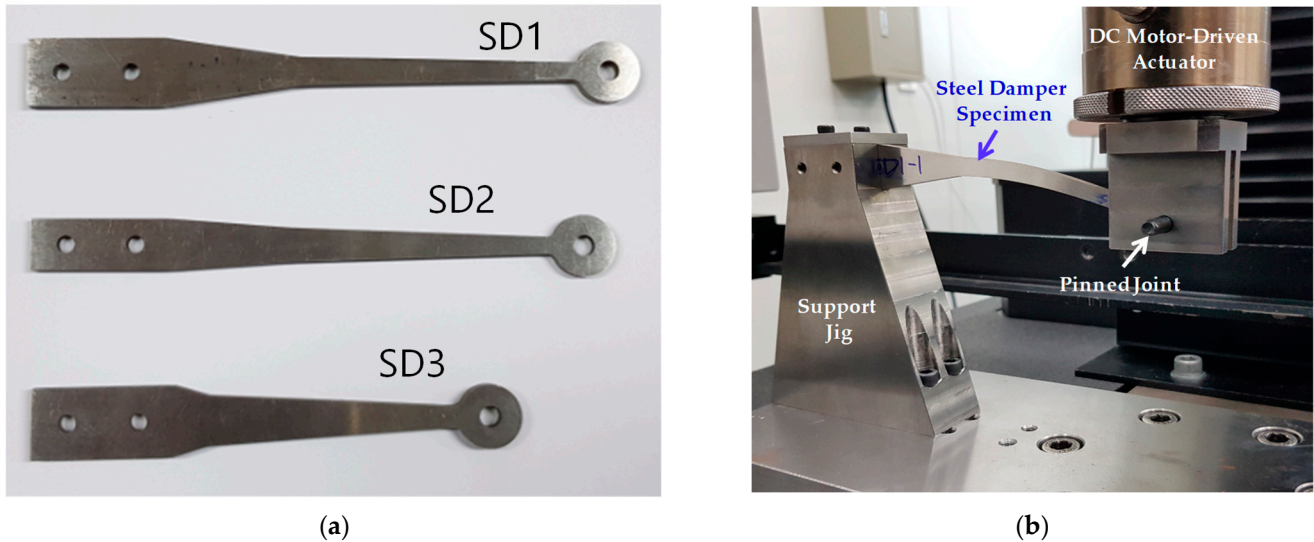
Photos of steel damper specimen and test facility: (a) Steel damper specimen; (b) test facility with specimen.
